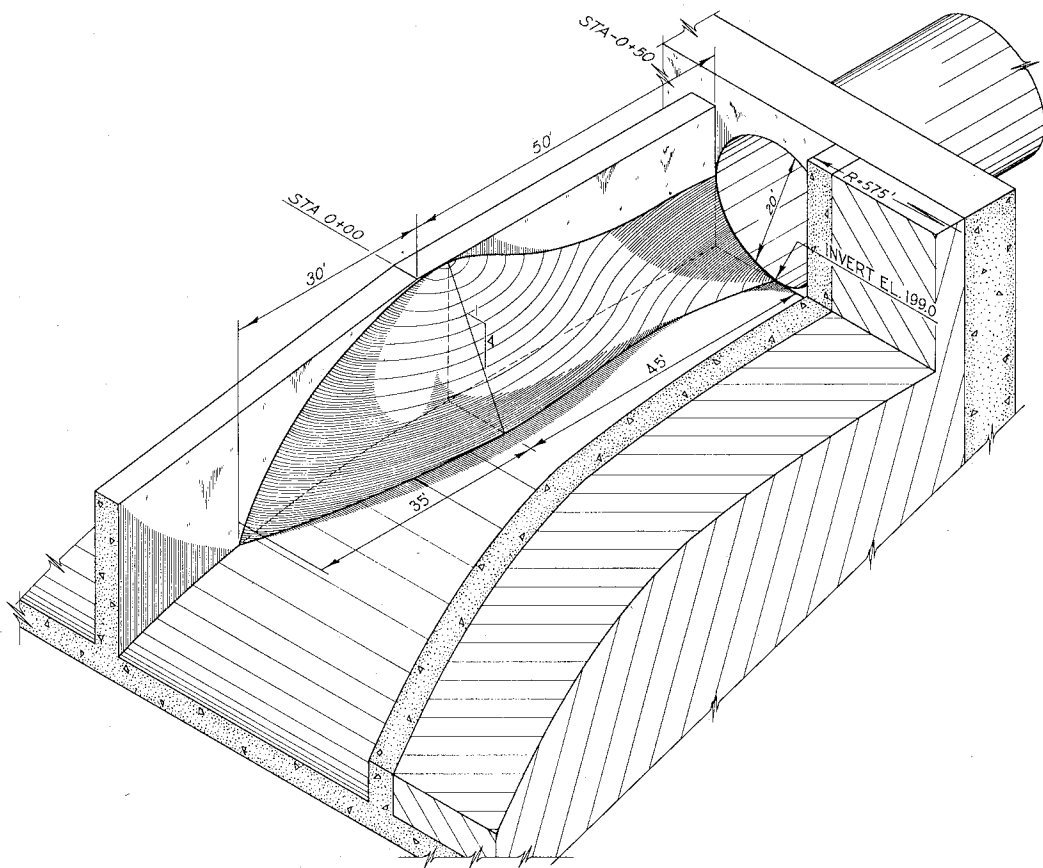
Wedge-shaped fillets adjacent to splitter wall in stilling basin
